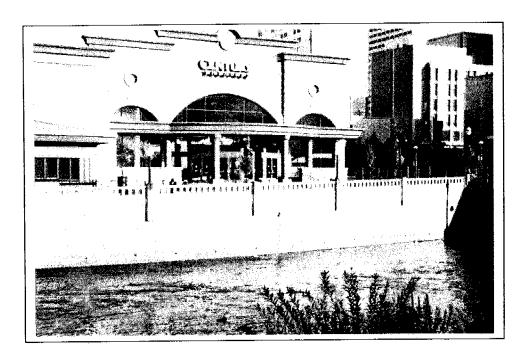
Section H. north bank, Peavine Creek east of Arlington Avenue, camera facing northwest, 10/24/01.
